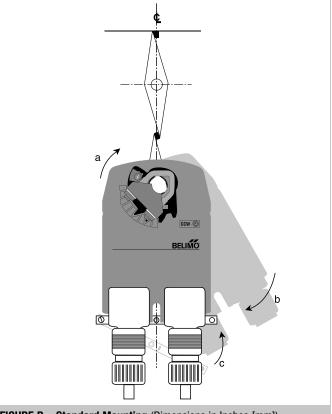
FIGURE B – Standard Mounting (Dimensions in Inches [mm])
